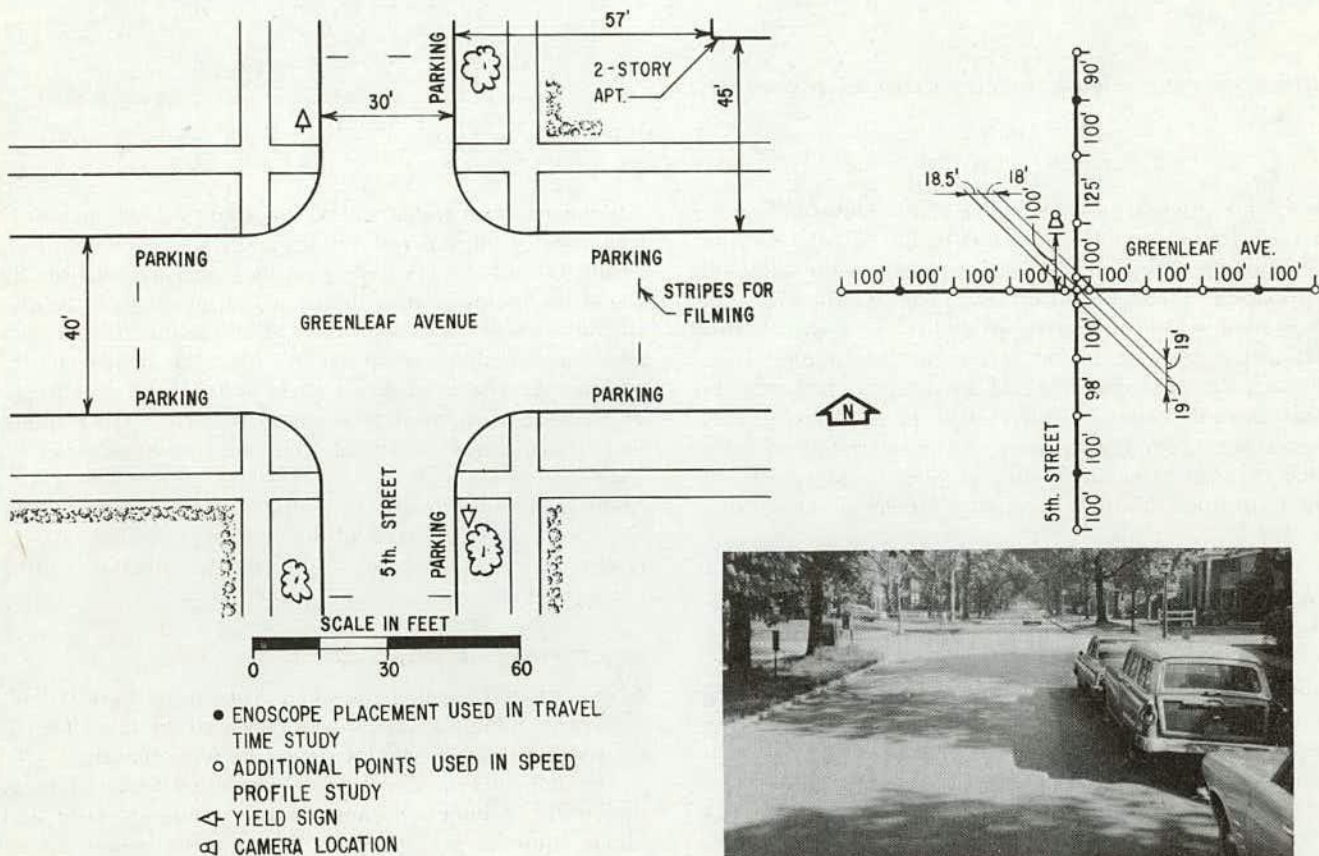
Intersection at 5th Street and Greenleaf Avenue (site A).
